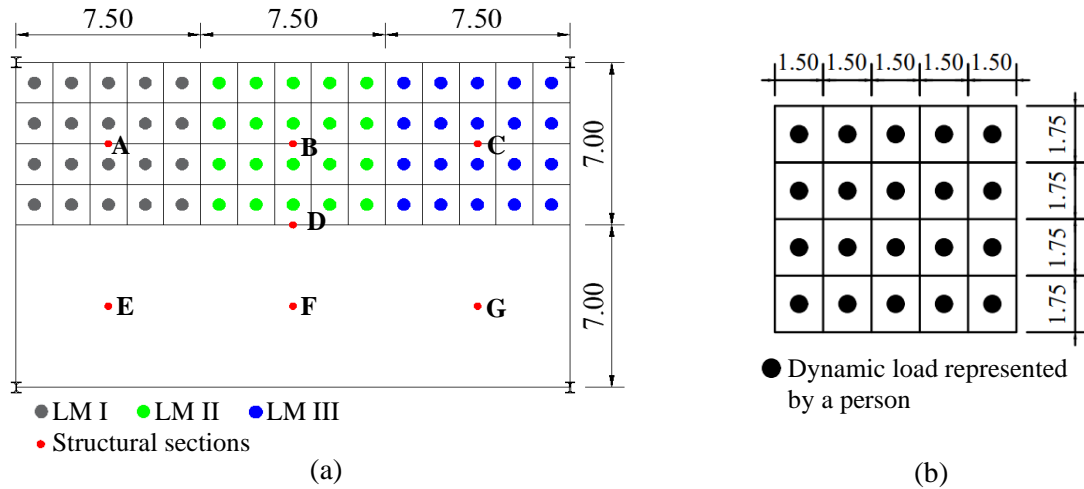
Composite floor (a) and load detail (b) (units in metres)
